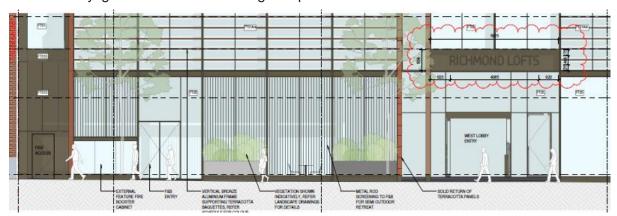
Church Street interface showing the Food and drinks premises (left) and main building entry (Decision Plans)
